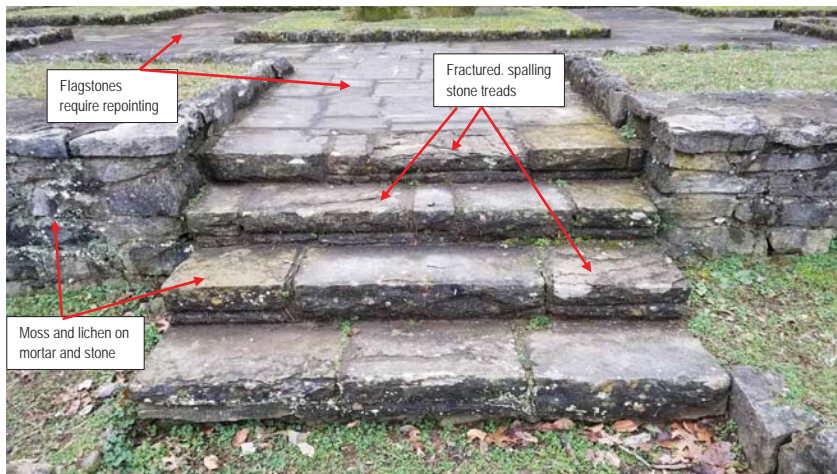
World War I Memorial west side of bridge. Note spalling stones, poor condition of mortar, typical of the memorial.
